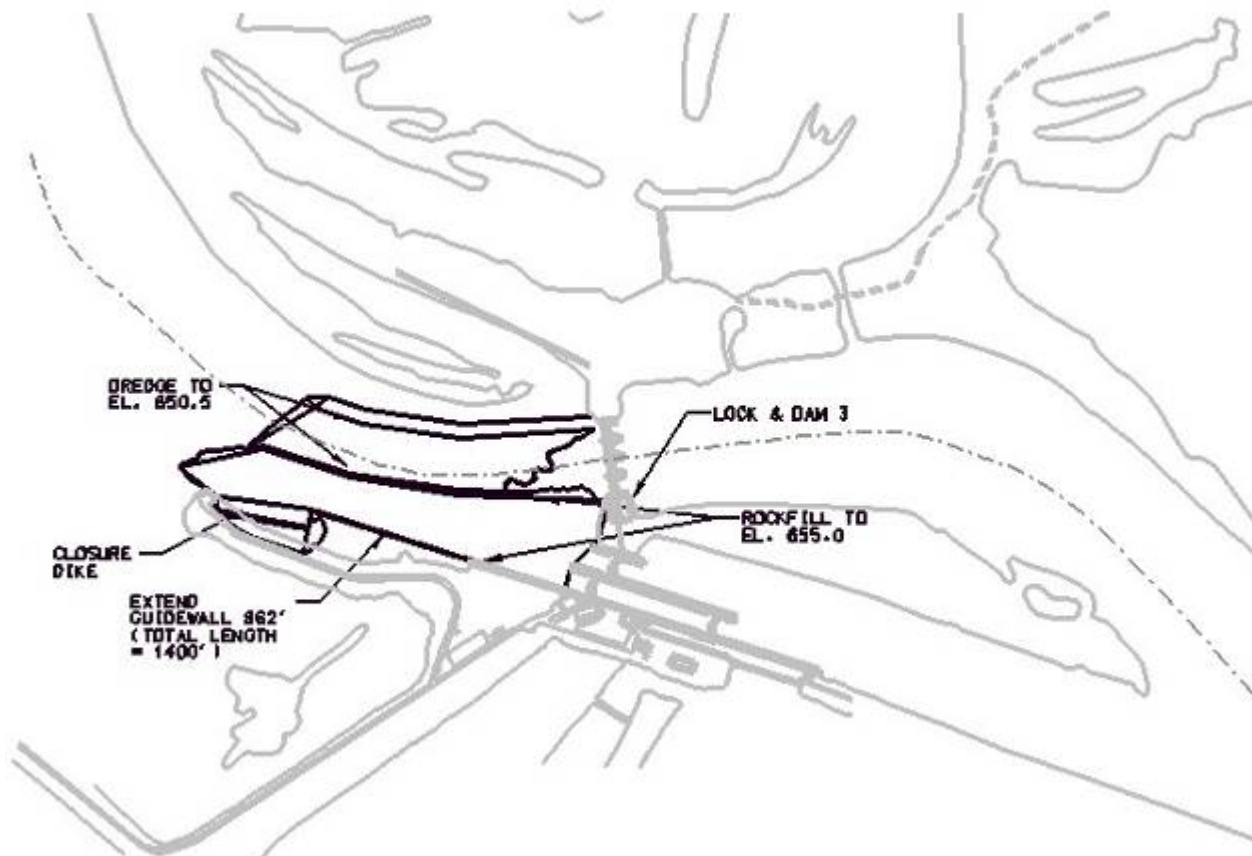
Alternative measure N6 extended guide wall with channel modifications.
